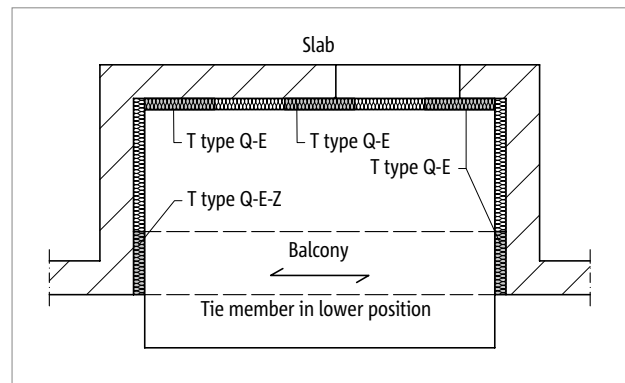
Schöck Isokorb® T type Q-E, Q-E-Z: Recessed balcony supported on three sides with tie member
